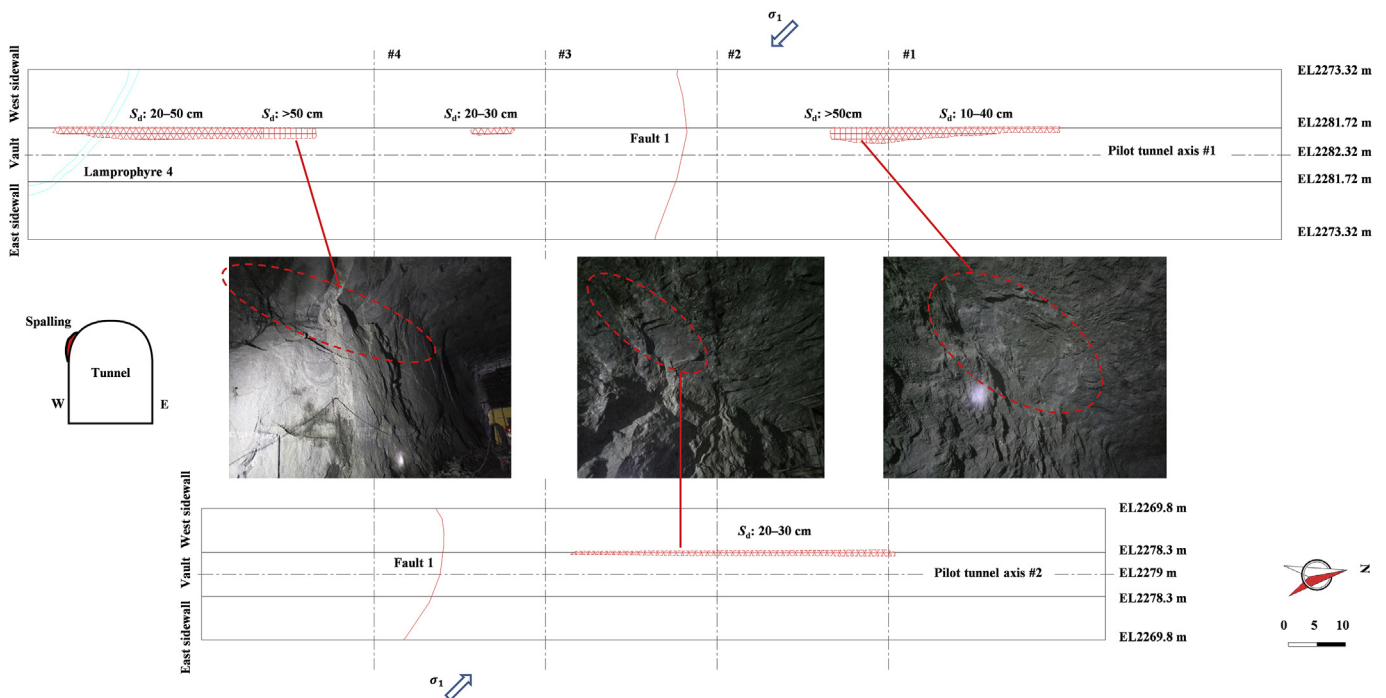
Spalling in the pilot tunnels in the Shuangjiangkou underground cavern group.
